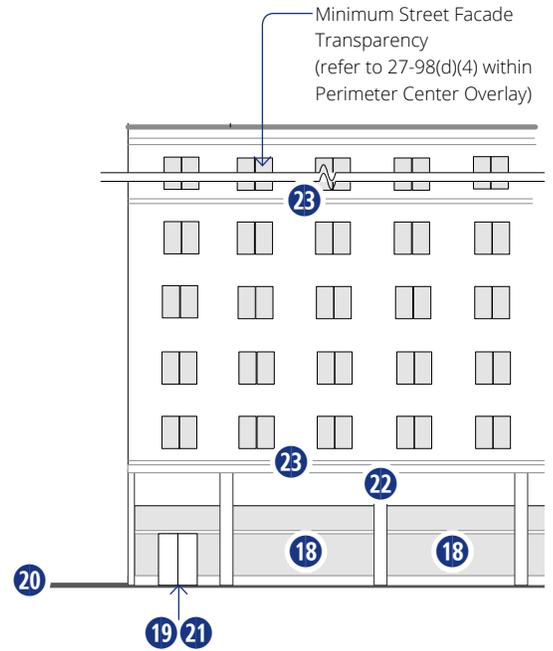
Shopfront Building: Street Facade Design Requirements
